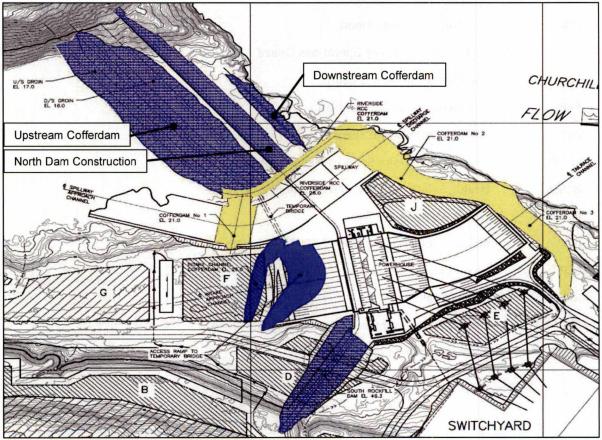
Muskrat Falls General Arrangement – Winter Headpond Construction Phase
